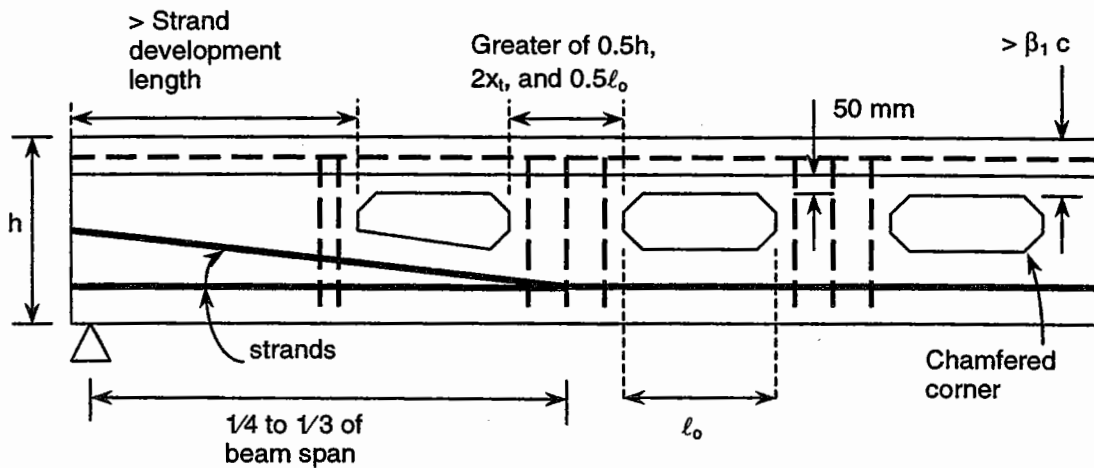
General recommendations for detailing of prestressed beams with web openings.
